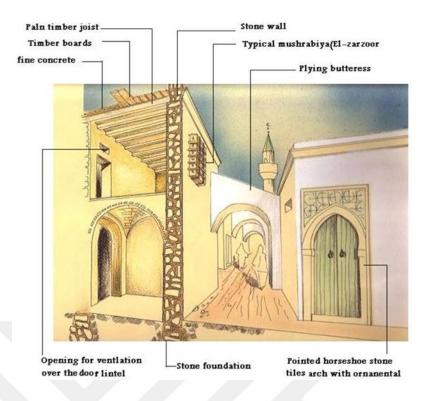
The form of Sector perspective shows how to build roof and wall (Adeema, 2015)
